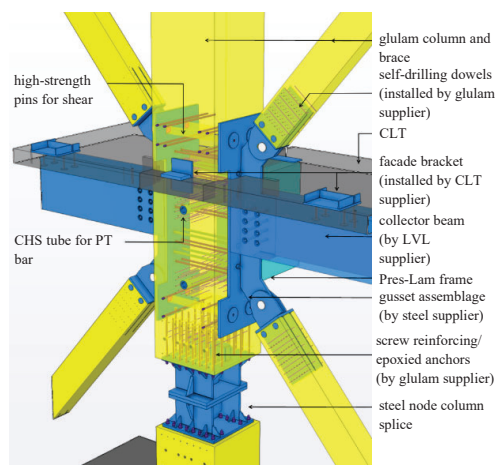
Typical beam-column joint at intersection of brace and Pres-Lam moment frame
